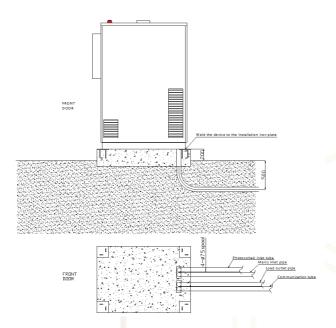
Equipment foundation drawing (unit: mm)
